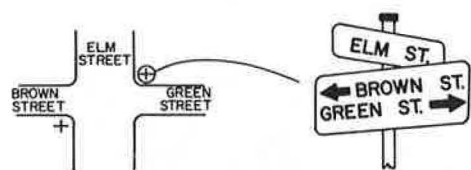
Suggested street name sign for special case in which street names on opposite sides of intersection are different.
